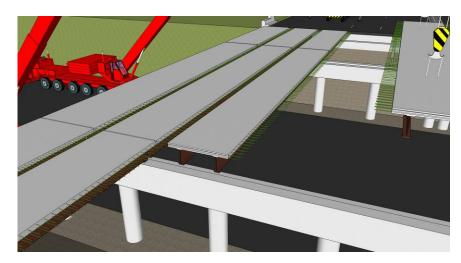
Modular Steel Topped Multi-beam Units
